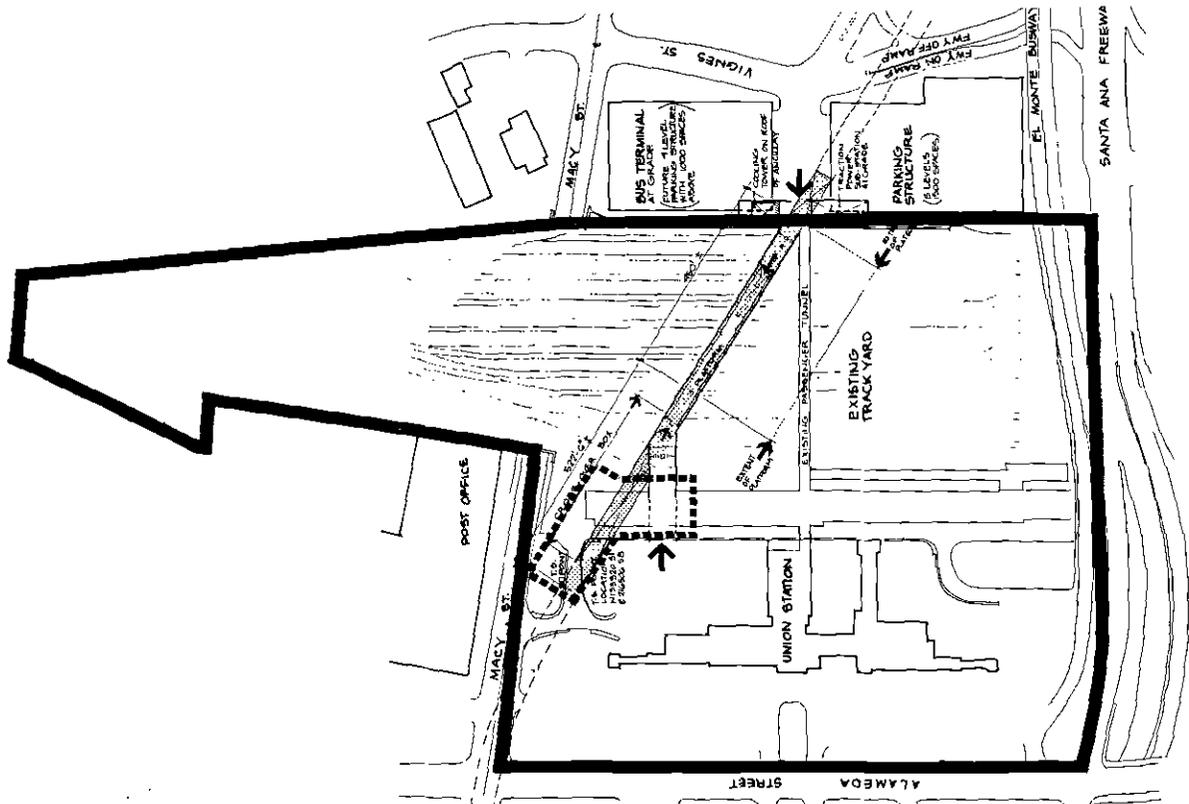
Los Angeles Union Passenger Terminal District Union Station - Alternative A
